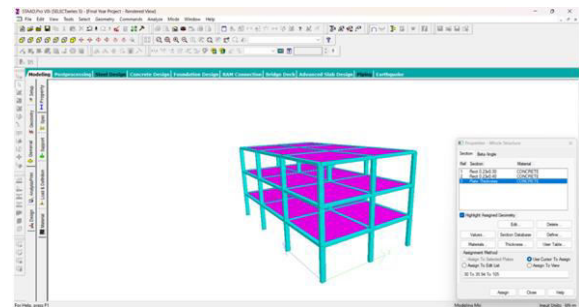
Rendered View of Beams, Columns, Slabs of Residential Building with Plate mesh
